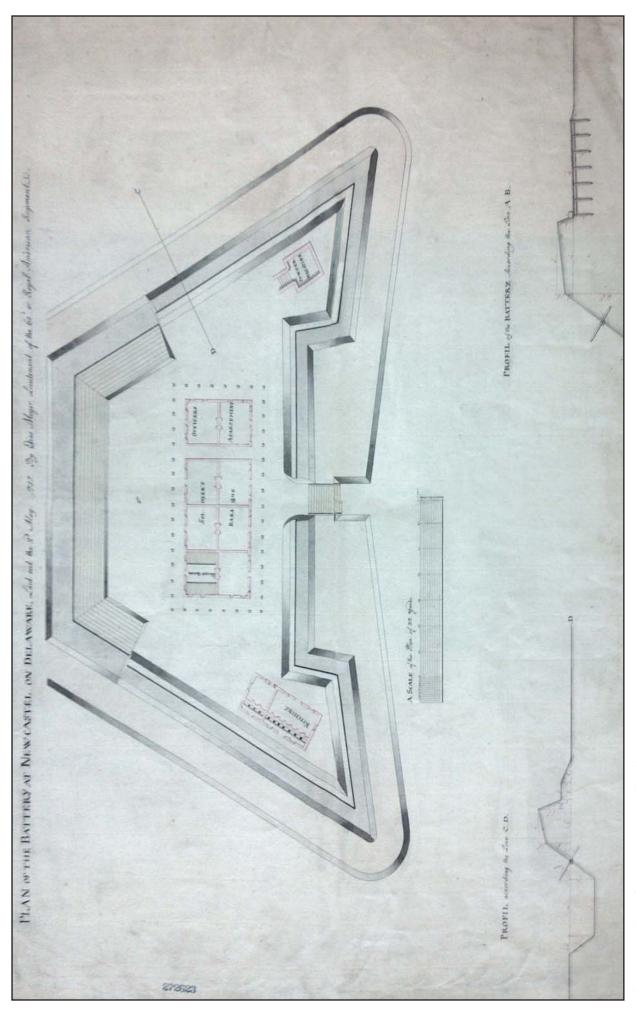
Plan of Battery at New Castle (Meyer 1757).
